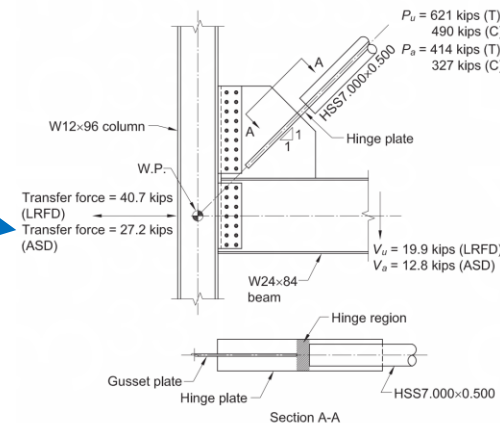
Brace connection to be designed for Example 5.3.12.
